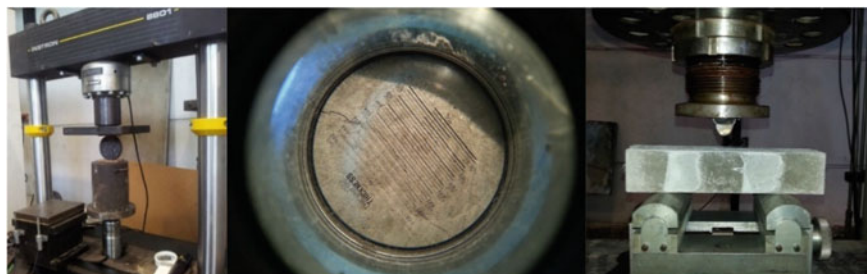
Cracking system of concrete discs and prismatic samples used. Mitutoyo Fisurometer used for crack width measurement
